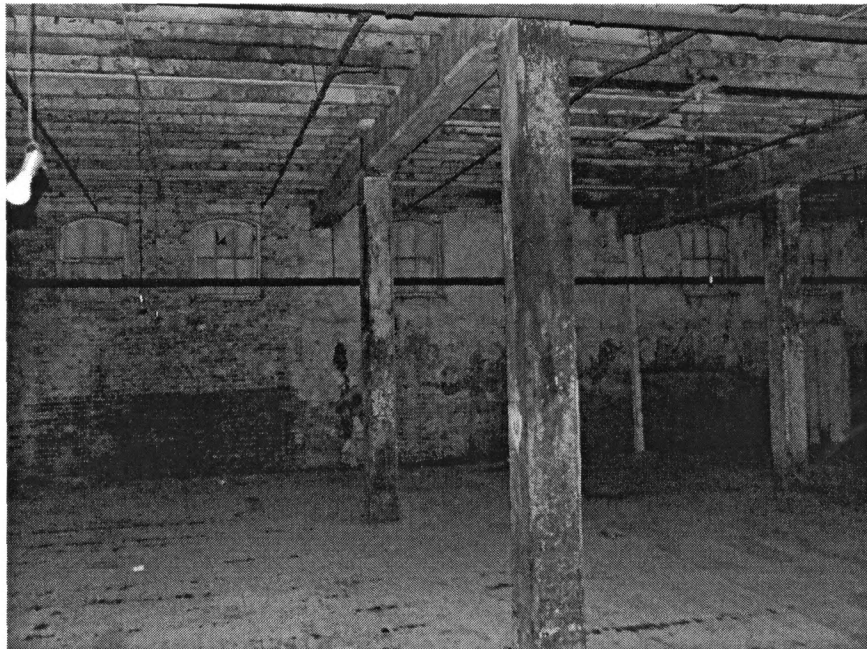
Press house, first floor interior, view southwest (this floor was four feet higher prior to The 1891 fire) (photo by J. Jacobsen, May 2007)
